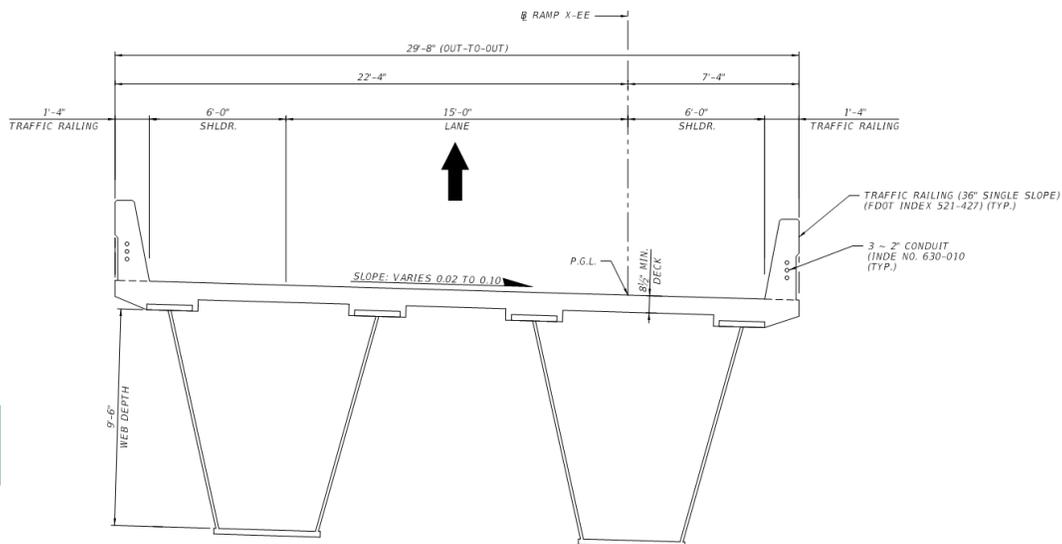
Bridge Typical Section (Bridge No. 11)
